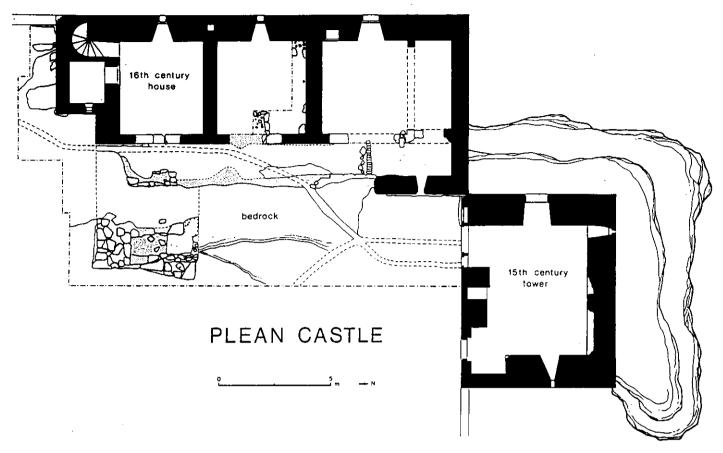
Plean Castle. Plan of buildings with location of trenches.
